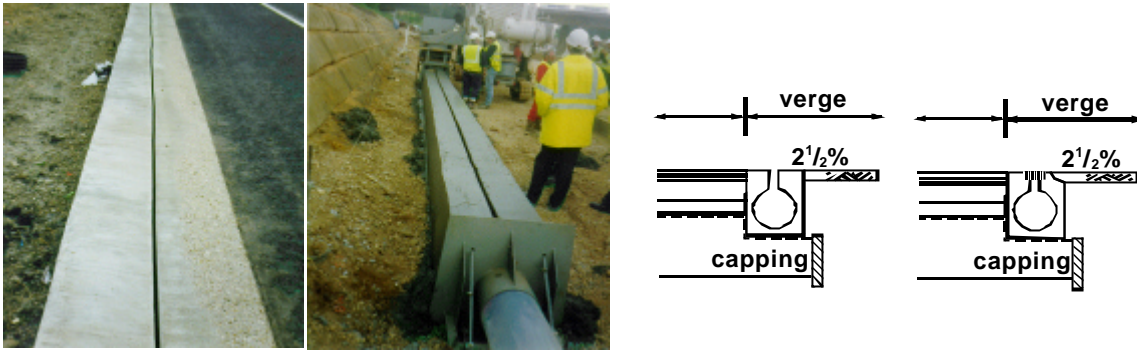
A typical scene of linear drainage channel and a layout of its construction.
